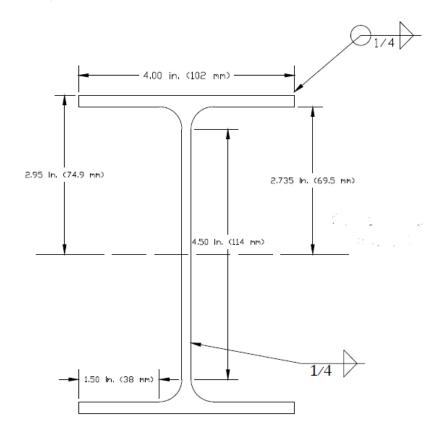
Top Post (W6X8.5) Weld Size
